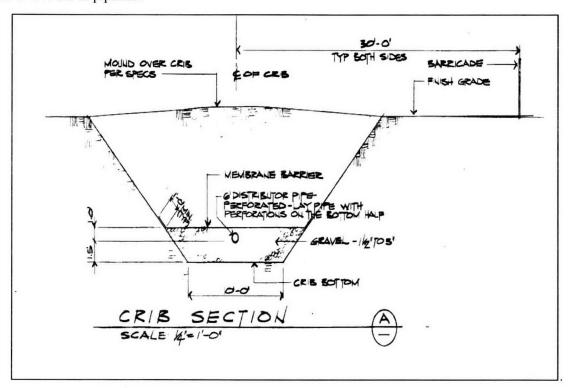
Cross Section of the 216-S-26 Waste Site
